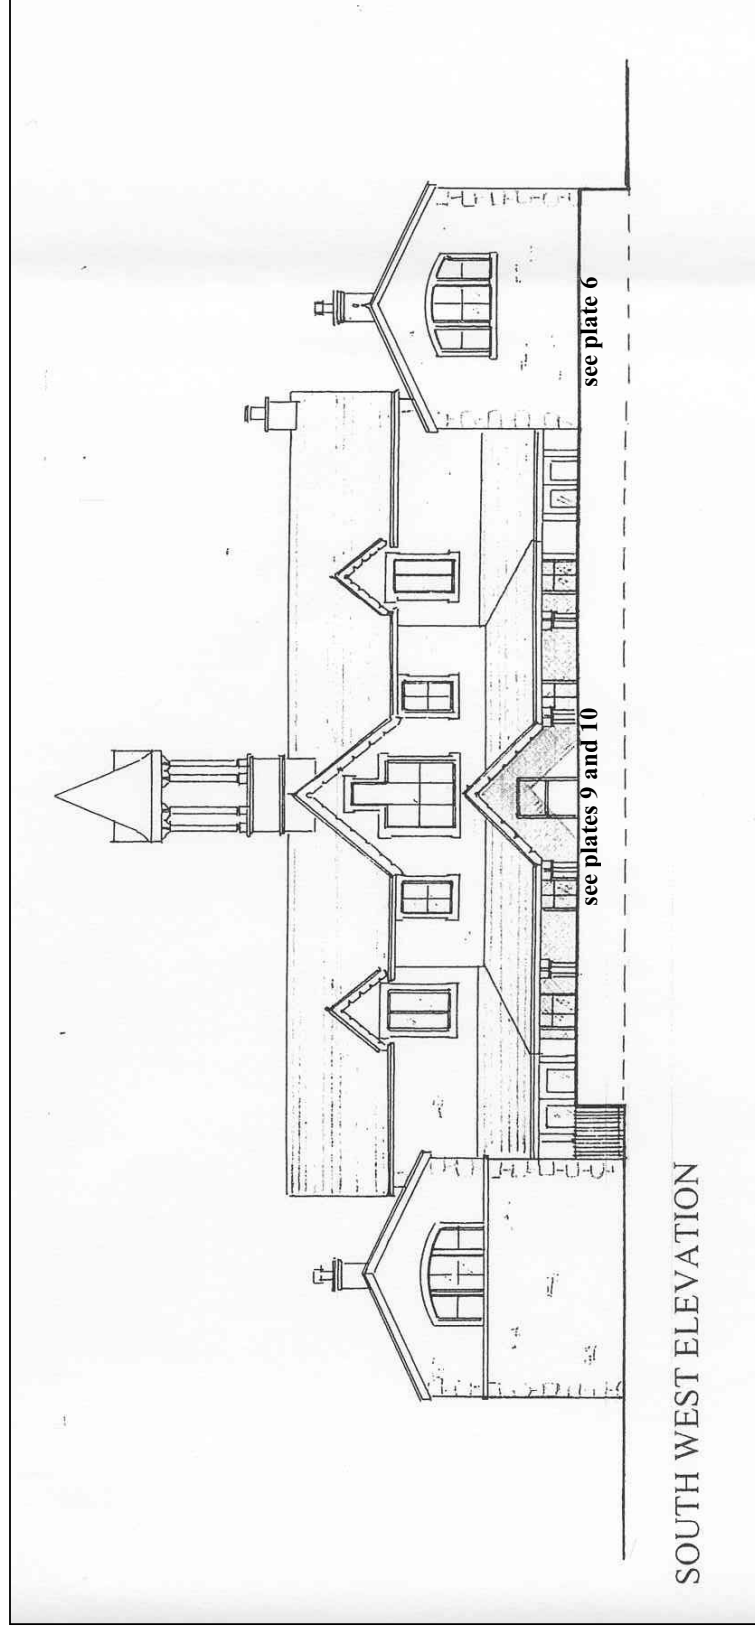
The Stable Block: South-West Elevation. Scale: 1:200
